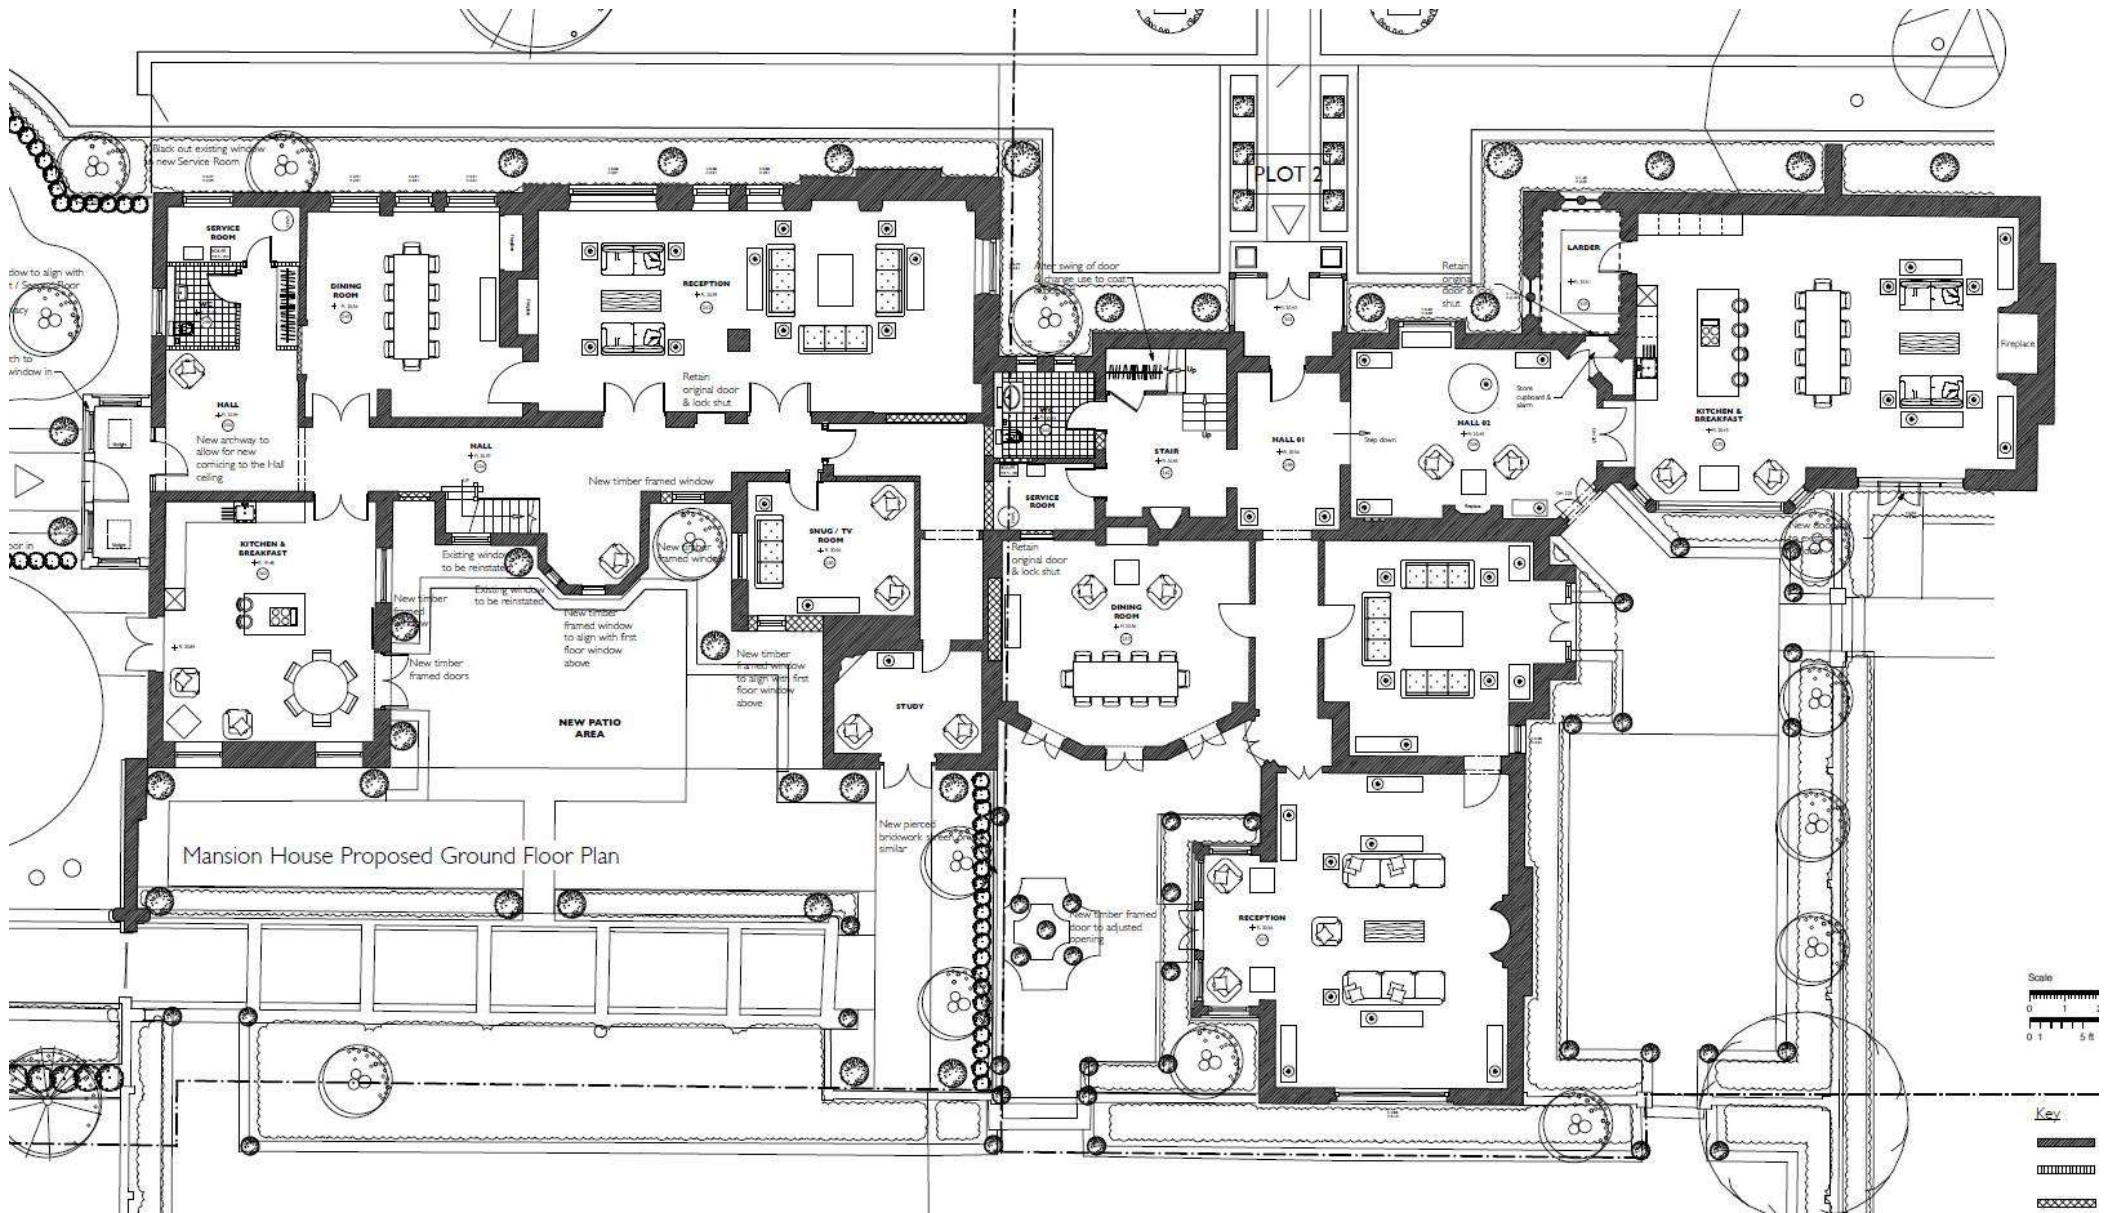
Proposed ground floor layout of Broadoaks as two houses
